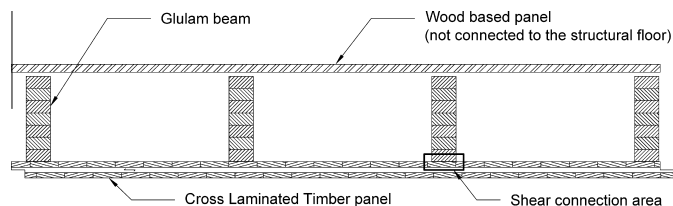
Example of glulam–CLT floor structure with the shear connection between the glulam beams and the CLT panel on the lower side.
